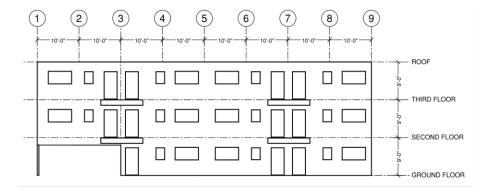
Long-side elevation of the design example three-story, short-side-open building, where wing walls are now shown.
